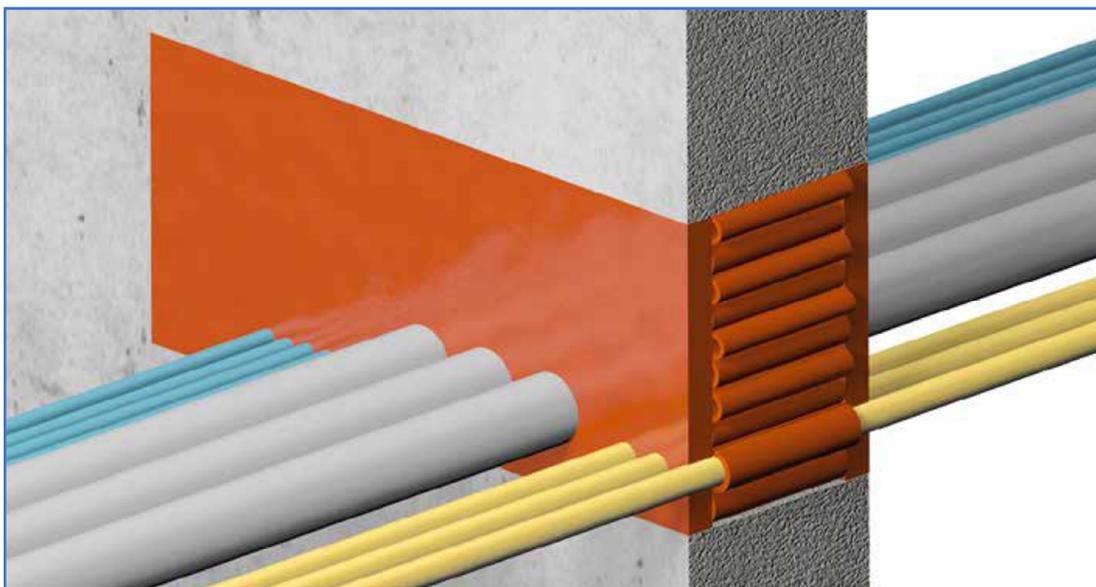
Principle of the NOFIRNO sealing system with cables in a concrete wall
